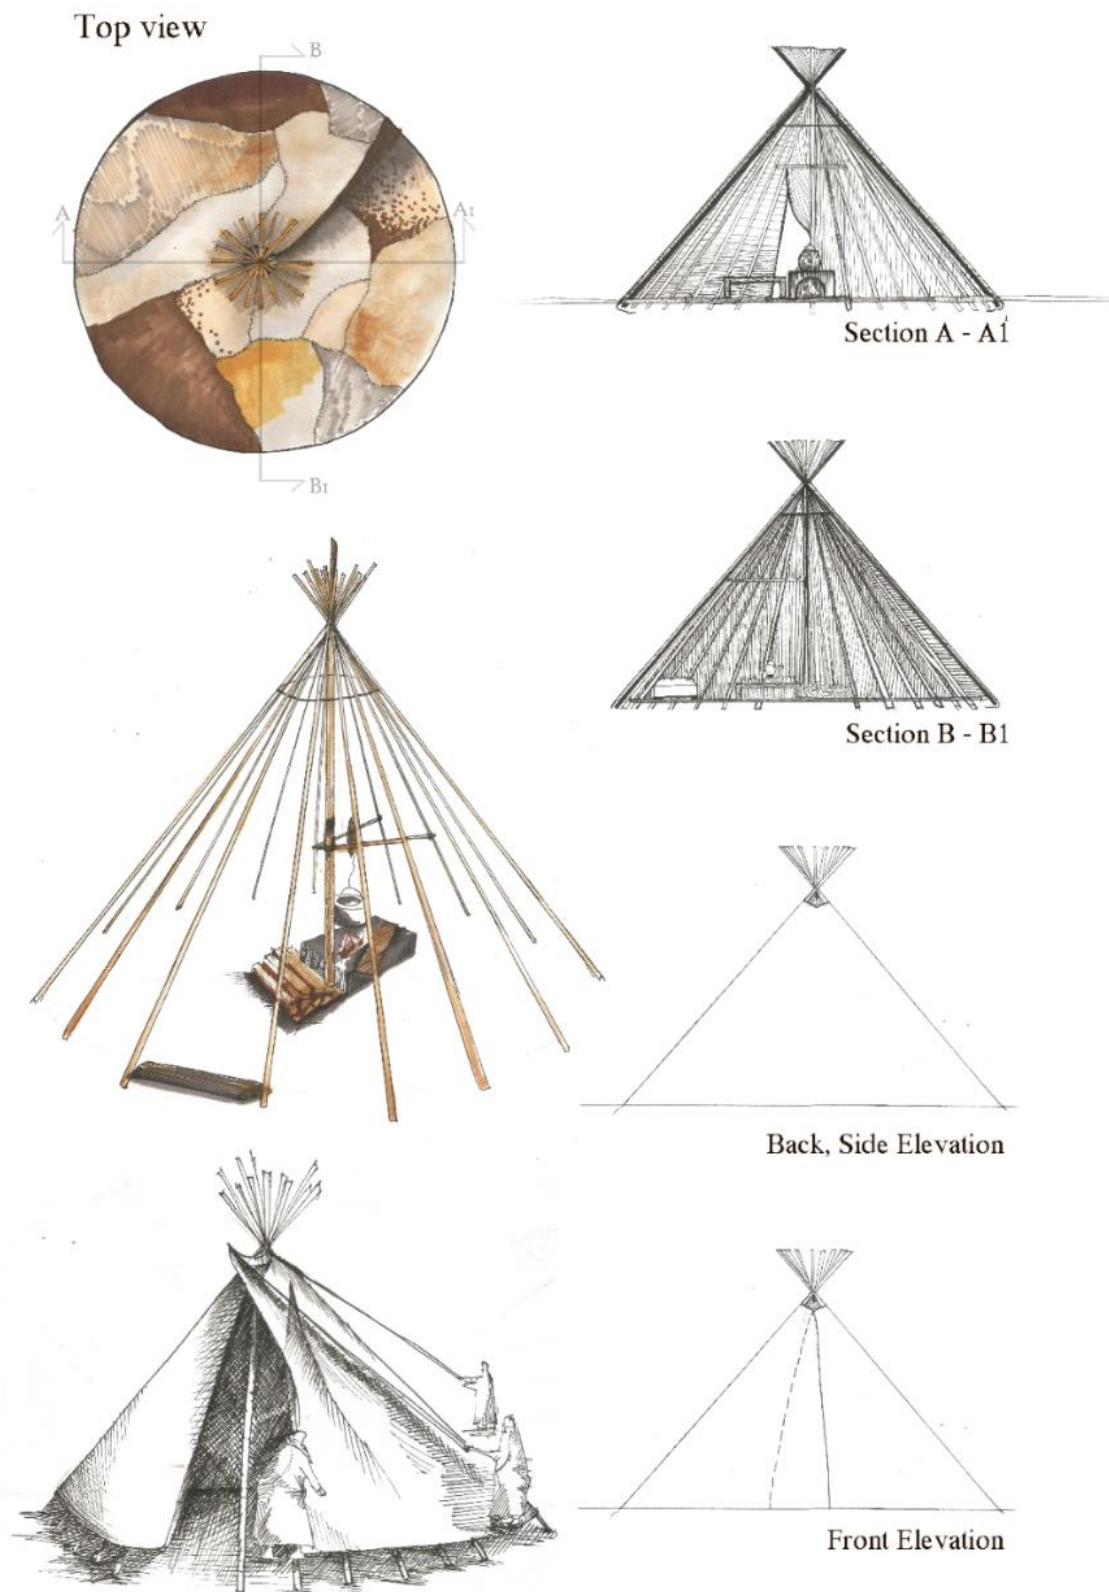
Elevations and sectional views; Chum illustrated during the construction process (Developed by Author).
